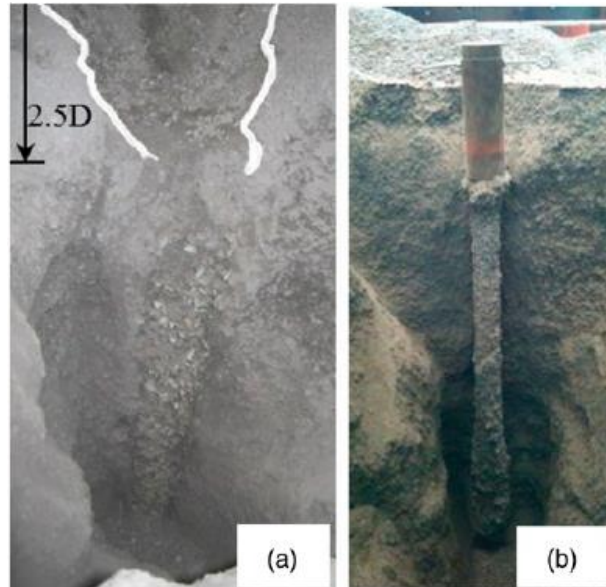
Mode of failure of columns (a) Bulging failure of granular columns (b) Punching failure of pervious concrete pile (Suleiman et al. (2014))
